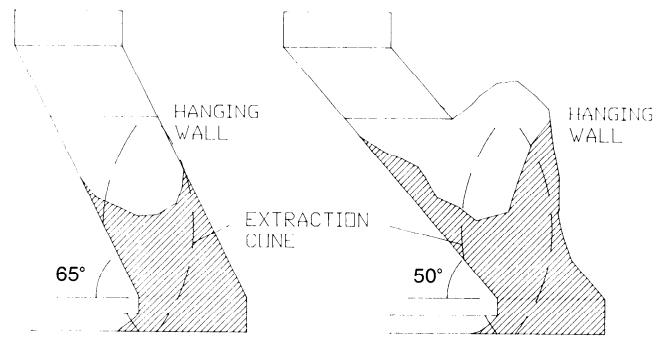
Cross section showing dilution incurred in a VCR stope with flat hanging wall.
